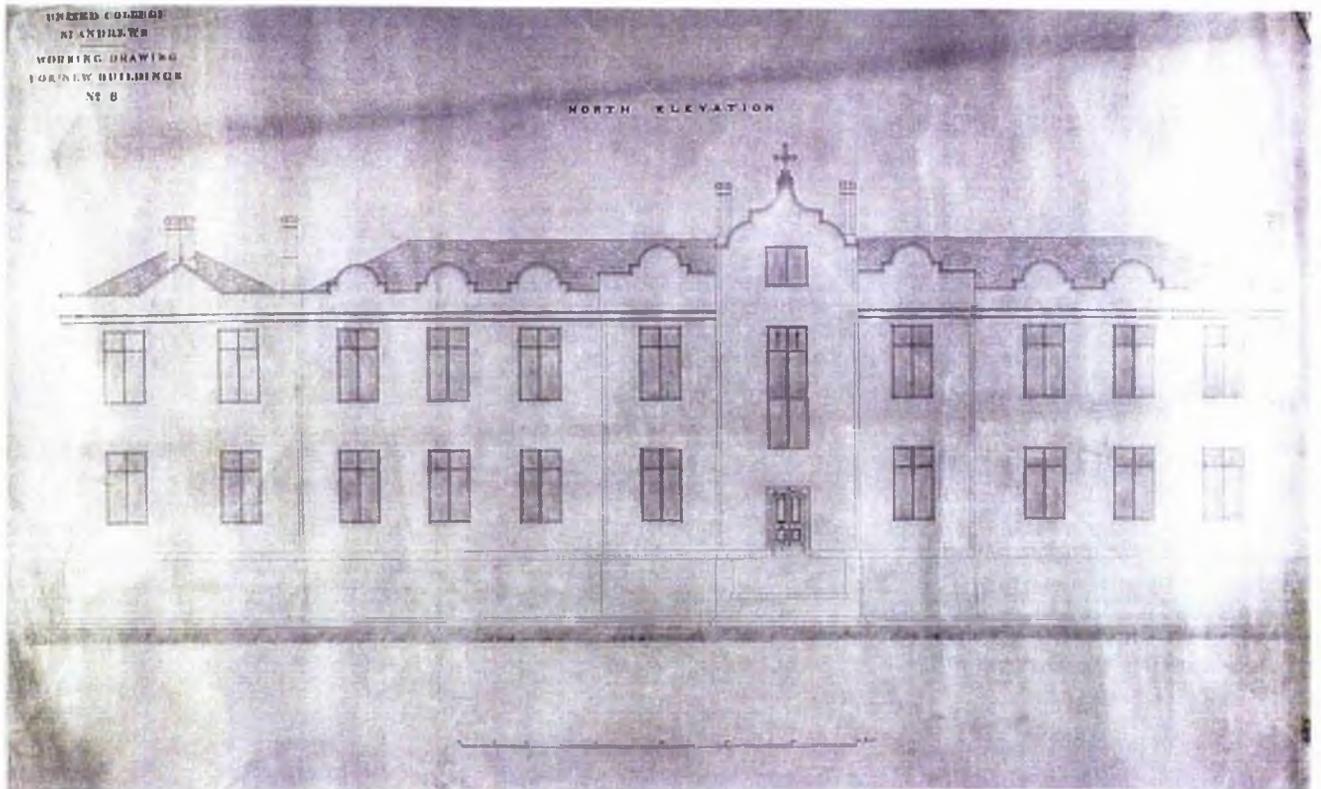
United College. North elevation of north building, working drawing No.8. W. Nixon, February, 1845.
